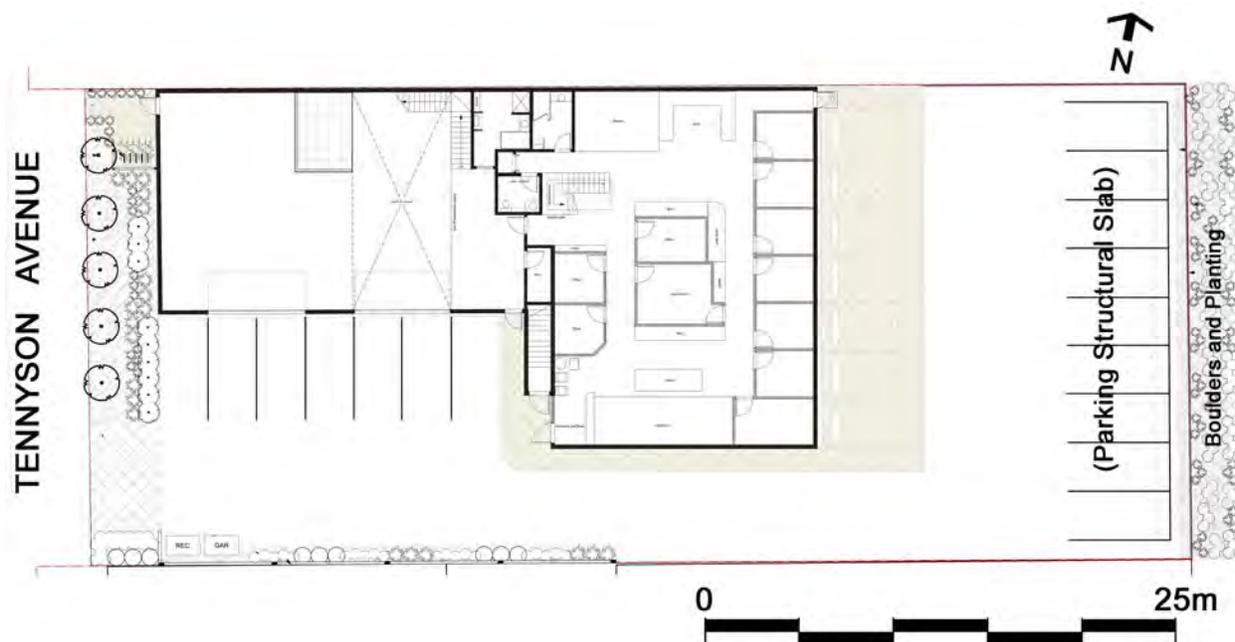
Site Plan (from plans by LADR Landscape Architects)
